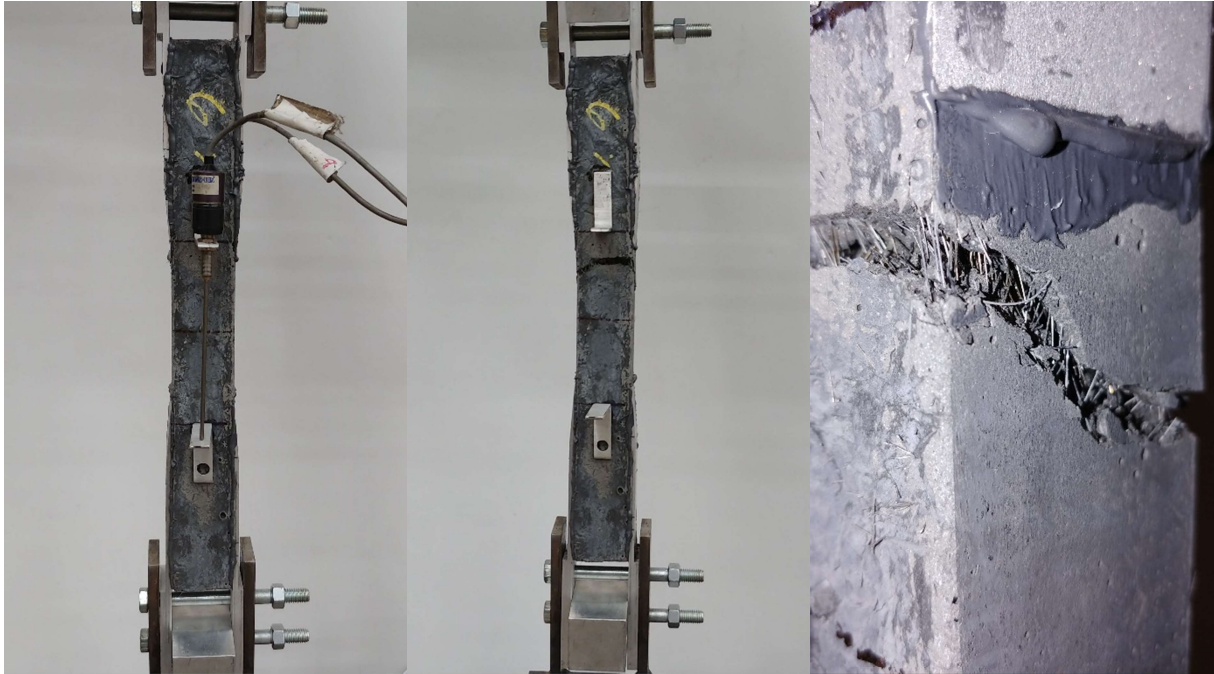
14 Crack pattern 6% steel fiber content Specimen 2
